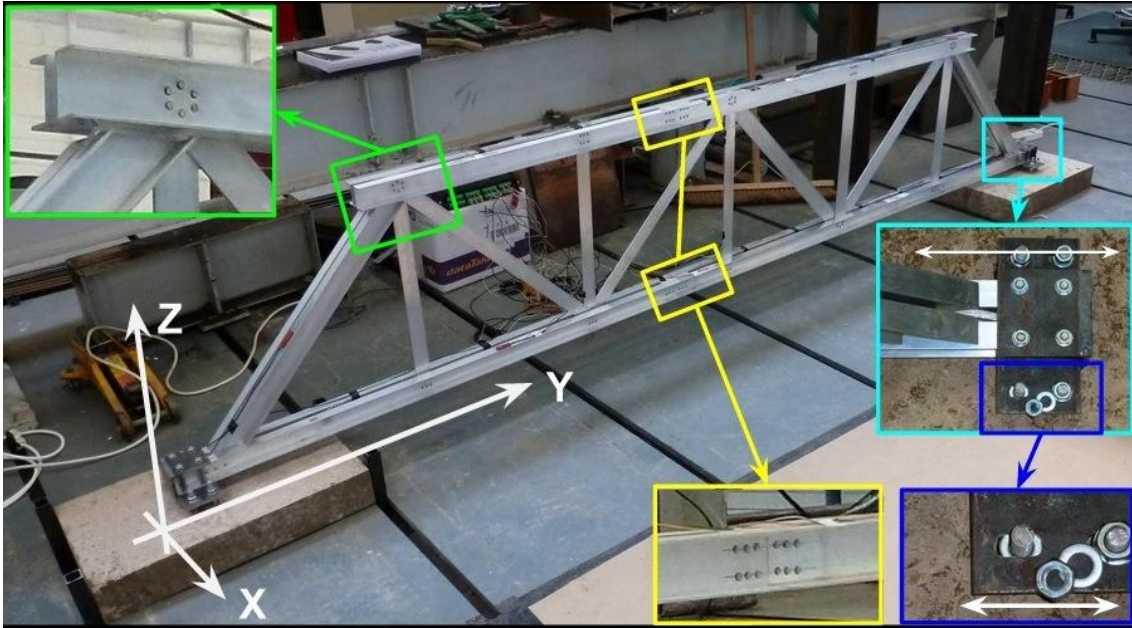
Photograph of the truss, with zoomed-in views of connection and support details.
